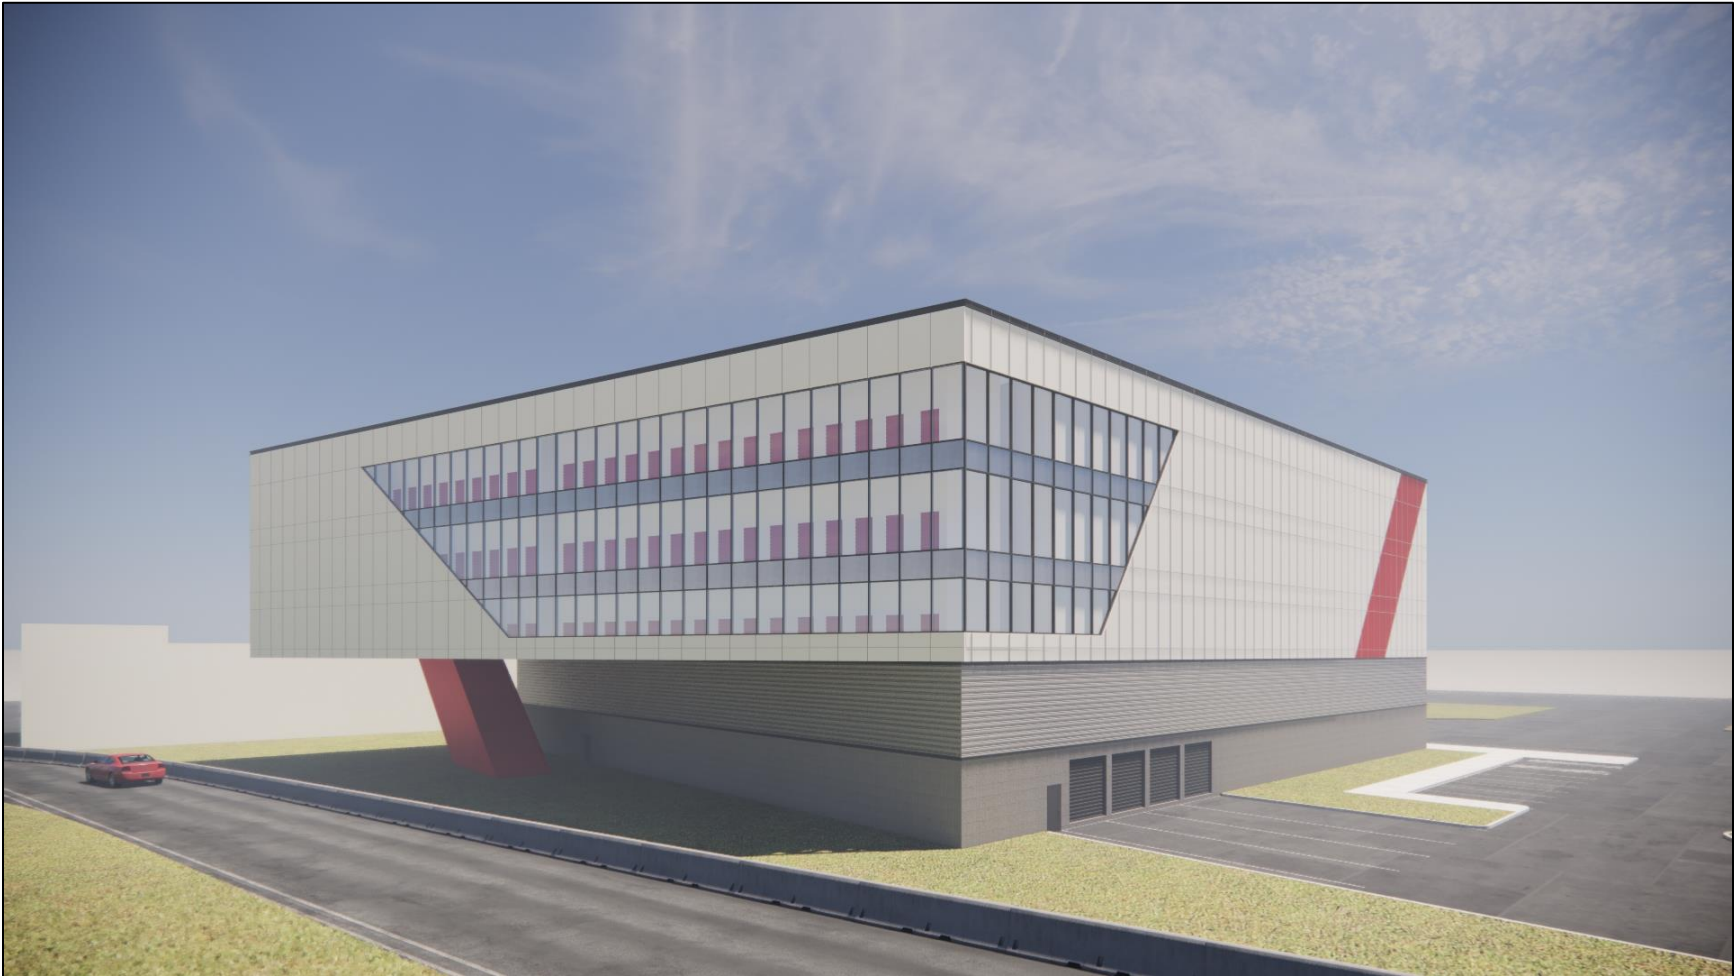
Preliminary Rendering - Building A - Looking southeast (prepared by Architecture49, December 2022)
